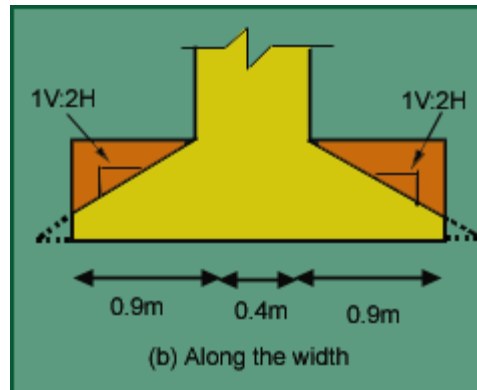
Area of footing B considered for check of transfer of load at column base
